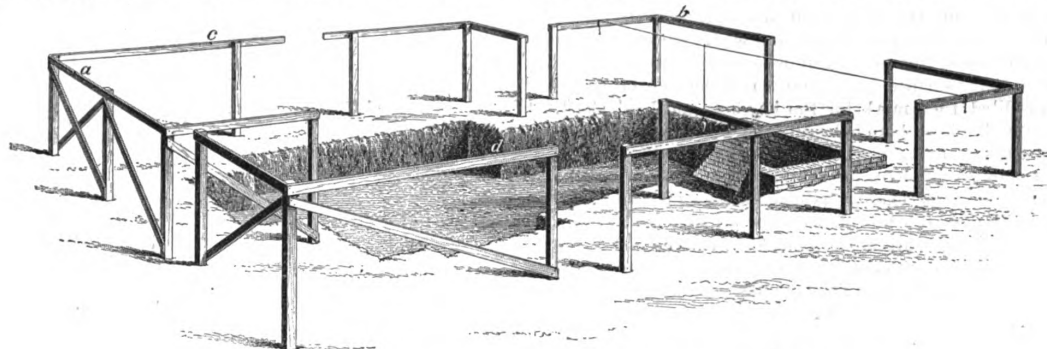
Perspective of Excavation for Foundation Walls, Showing "Batters" in Position.
